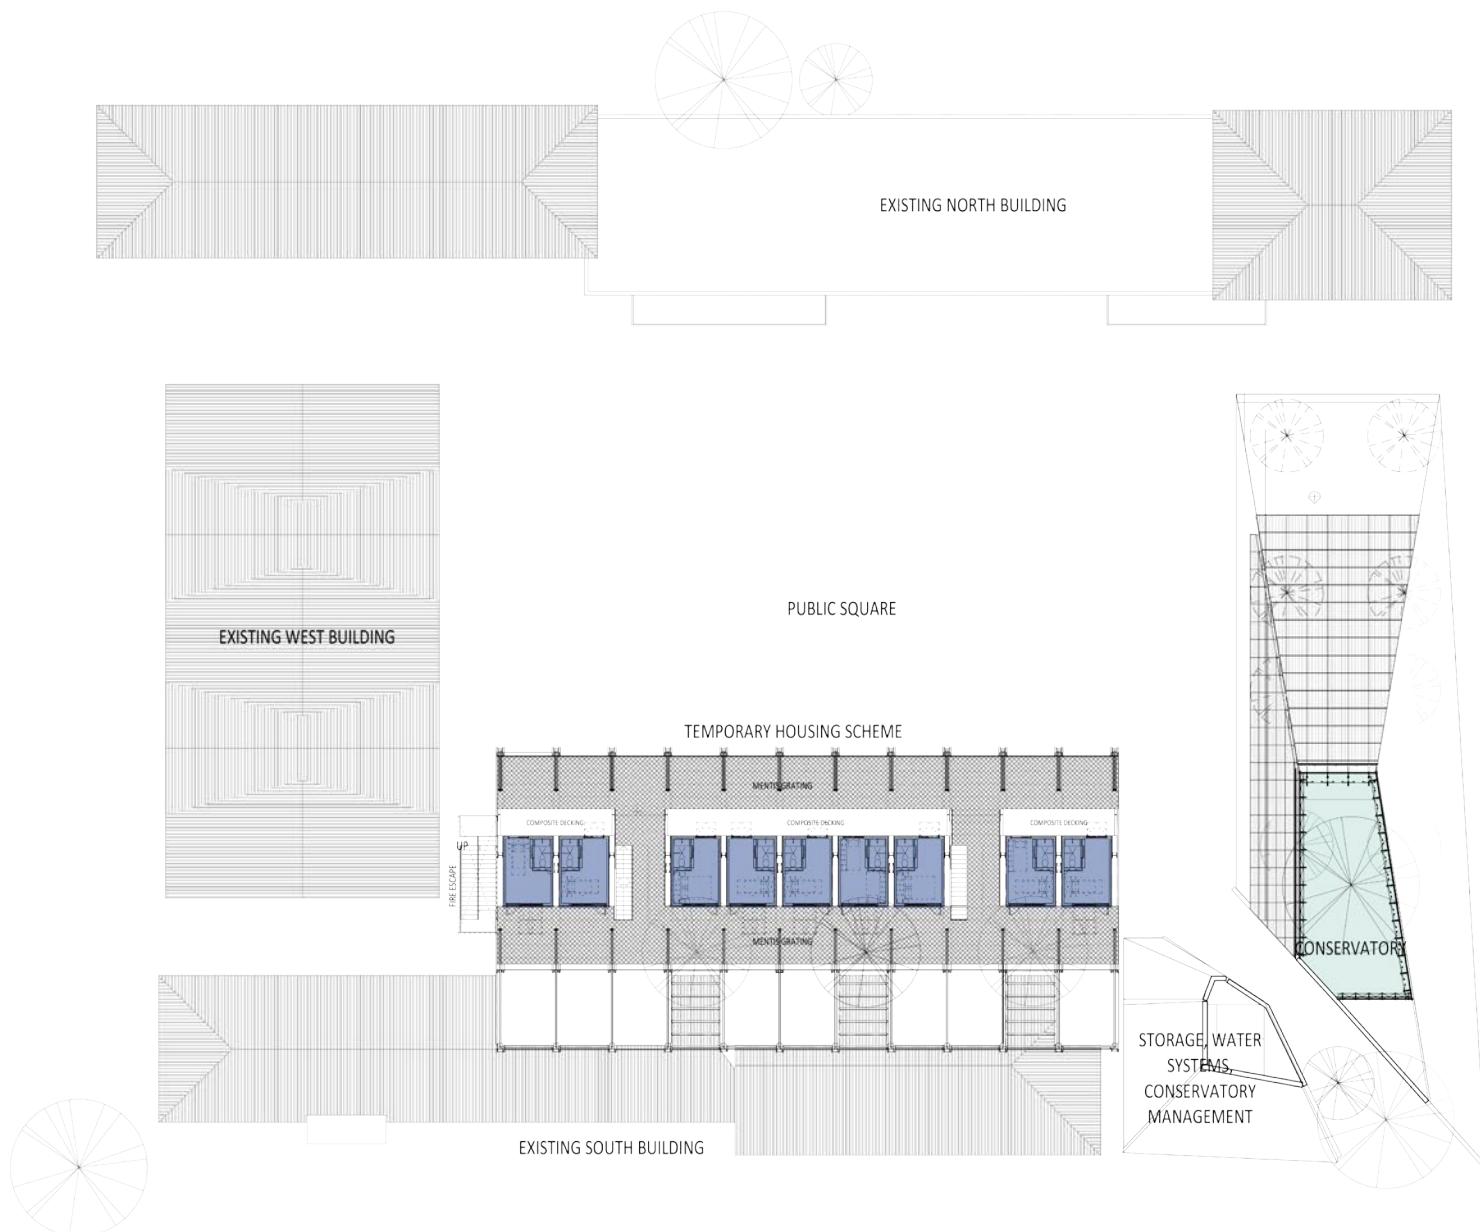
Third Floor Plan illustrating programmatic allocation
